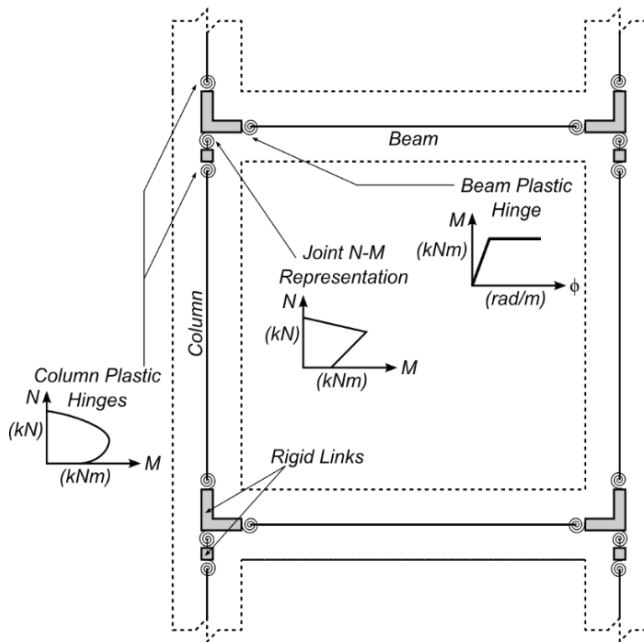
Structural modeling approach incorporating the joint capacity N-M envelope concept
